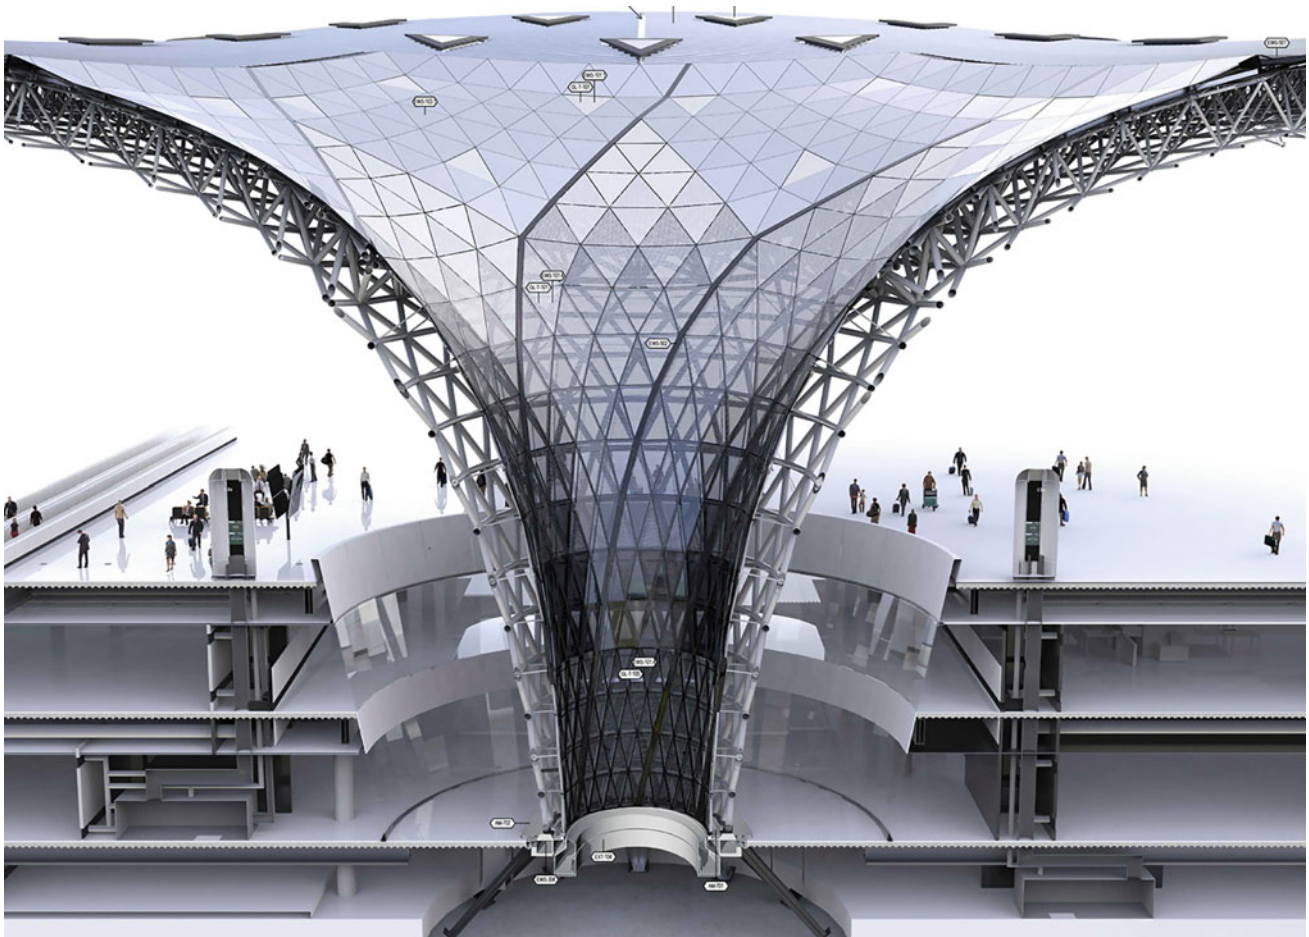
Funnel structural support (NAICM) Image Courtesy FR-EE / F + P | JV
